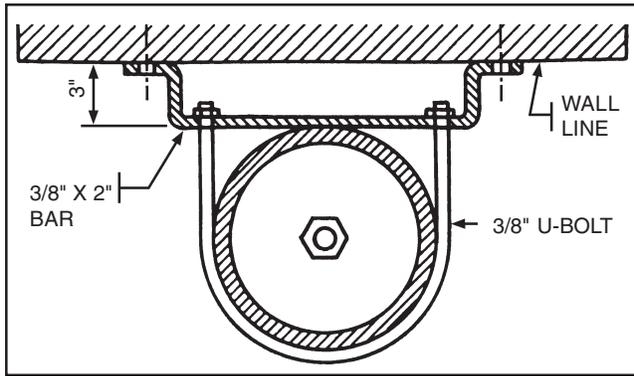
The sketch above shows the detail of the hydraulic support and the method of installing it. Note that about 2 or 3 inches clearance between the hydraulic and the wall or supporting structure should be provided.
